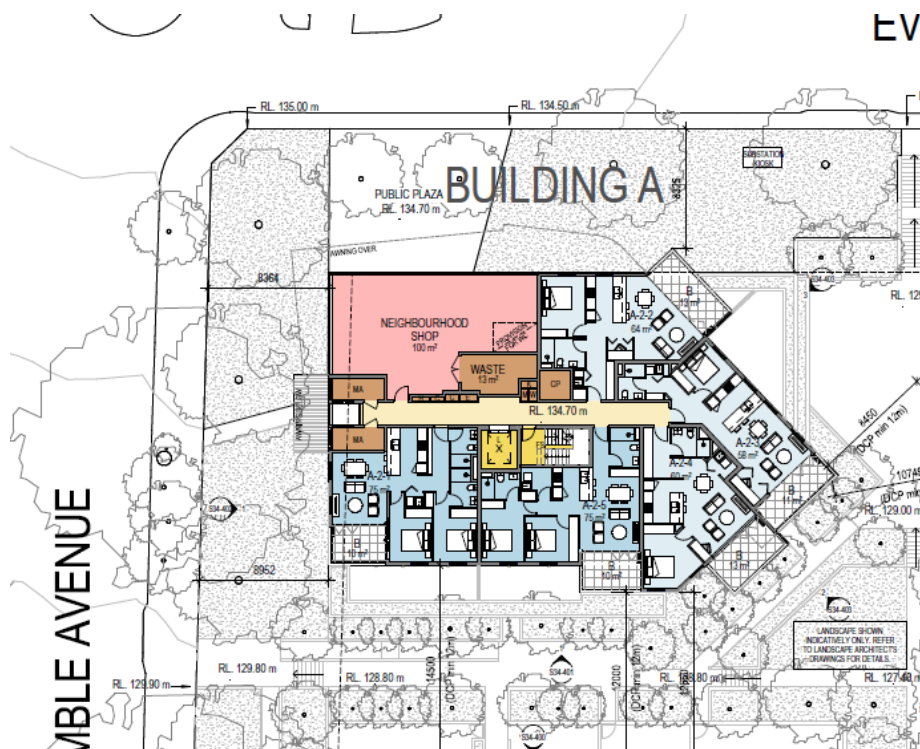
Extract from approved ground floor plan (Building A) indicating the location of the approved neighbourhood shop
